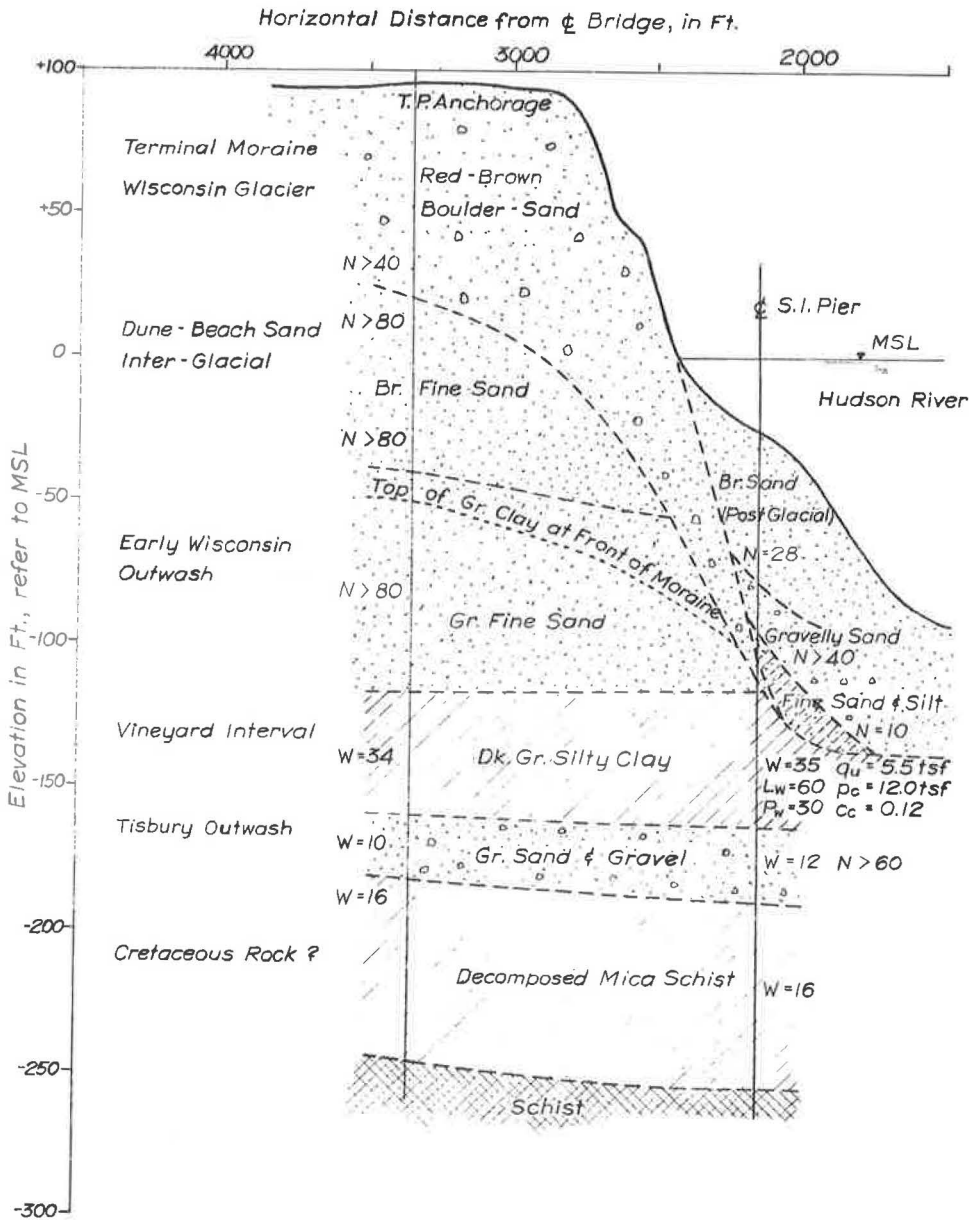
Soil profile at Staten Island site—Narrows bridge.
